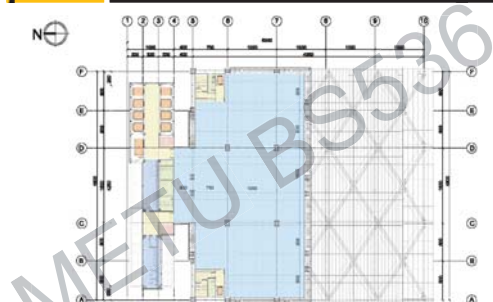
15th Floor Plan, drawn by Ozan Taşlı
